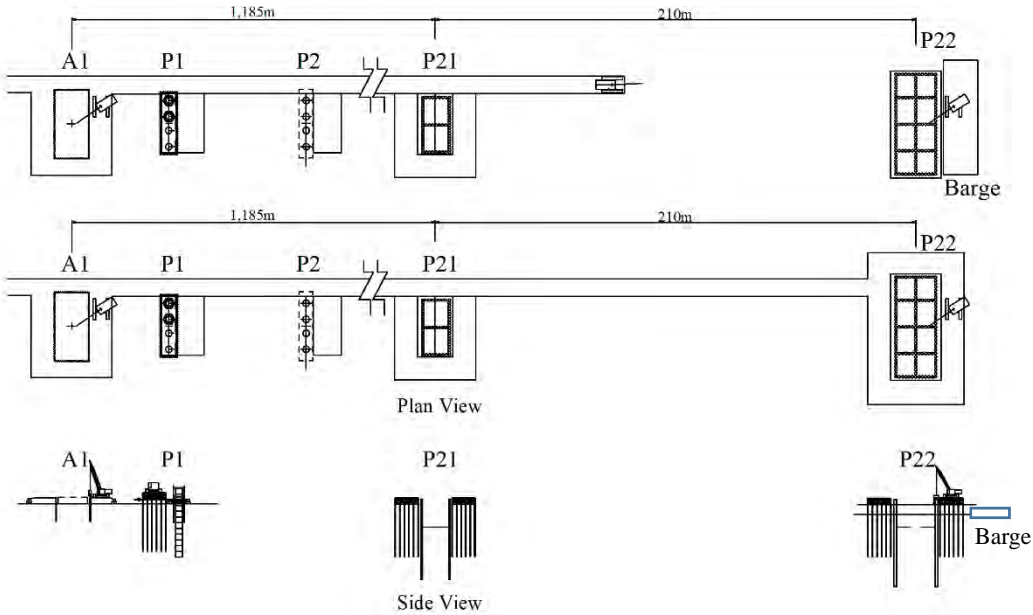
Reference Drawing for Temporary Construction on the Left Bank
